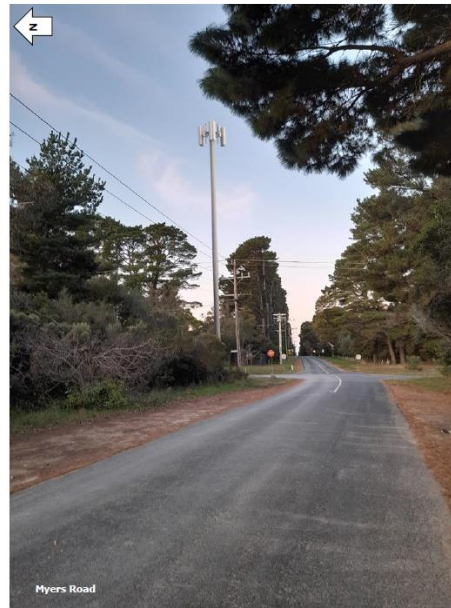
Montage 2 - Artist's impression of proposed facility. View looking east towards the indicative proposed site. Viewpoint is from approximately 105m west. (Original Image Source: Downer).
